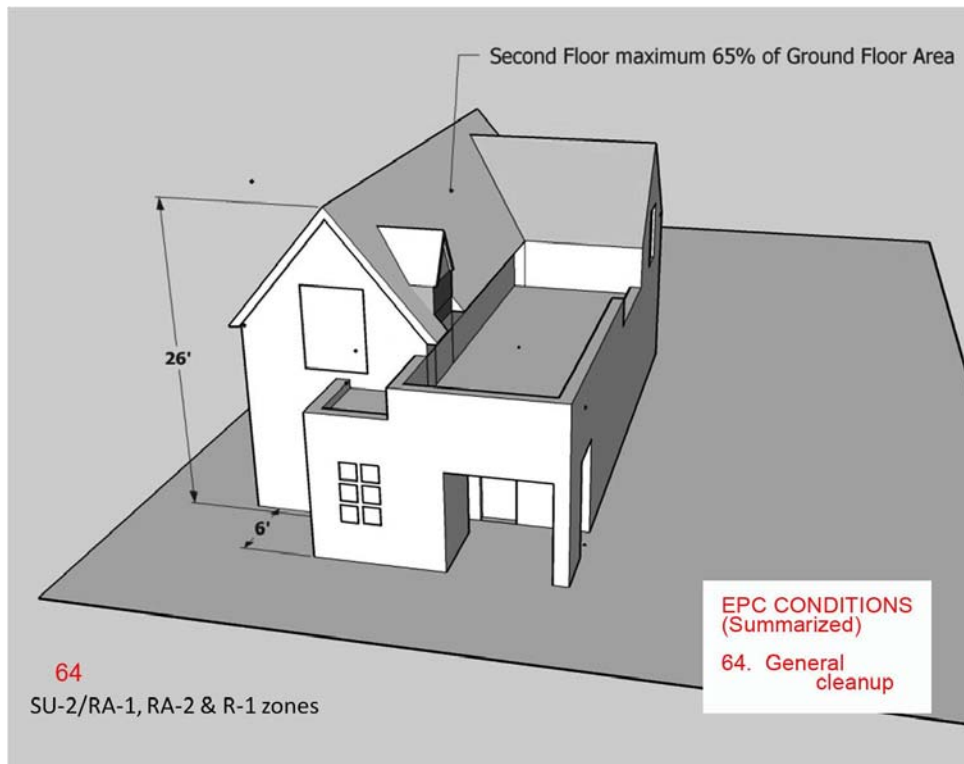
Figure Y Example Pitch Roof House: showing height standards and second floor area maximum
